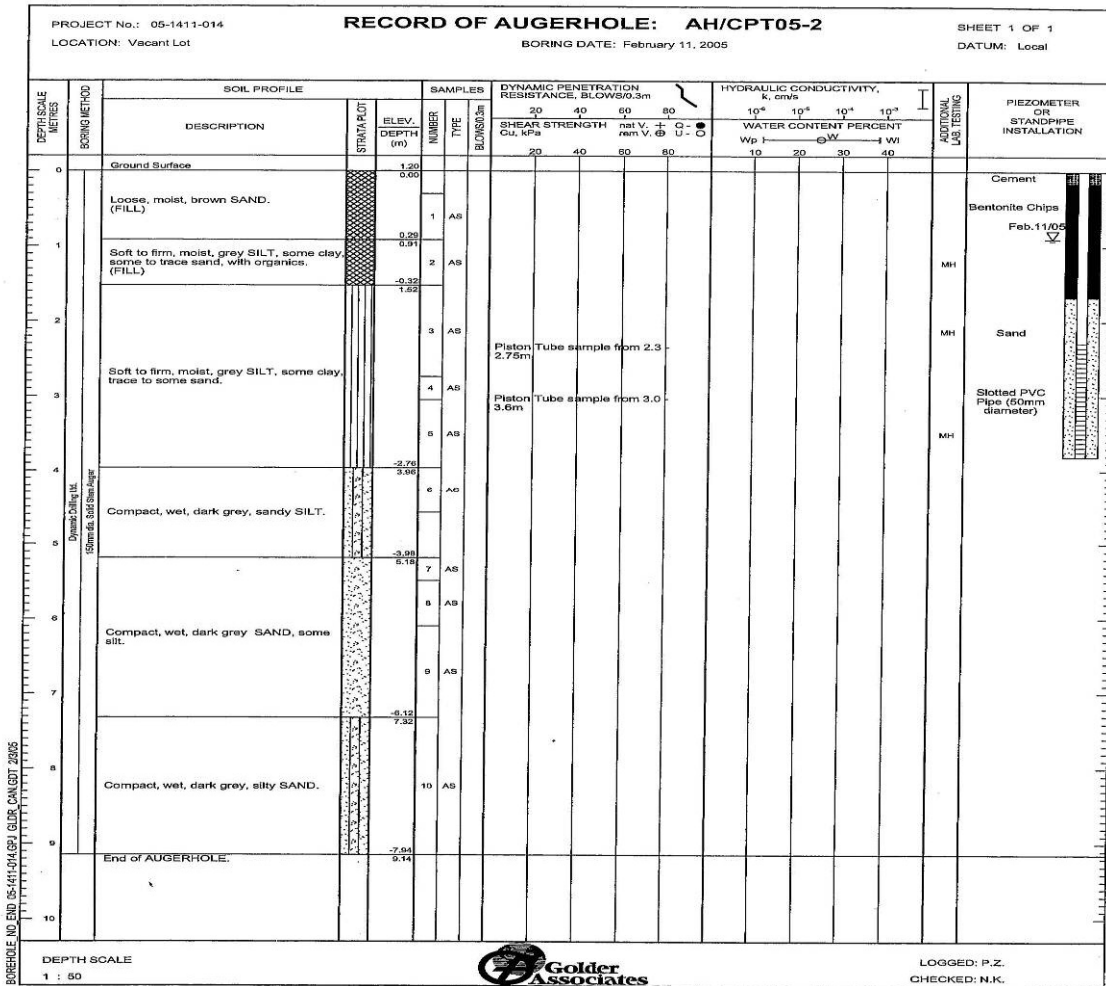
Typical Soil and Groundwater Conditions in Richmond, British Columbia, Canada
